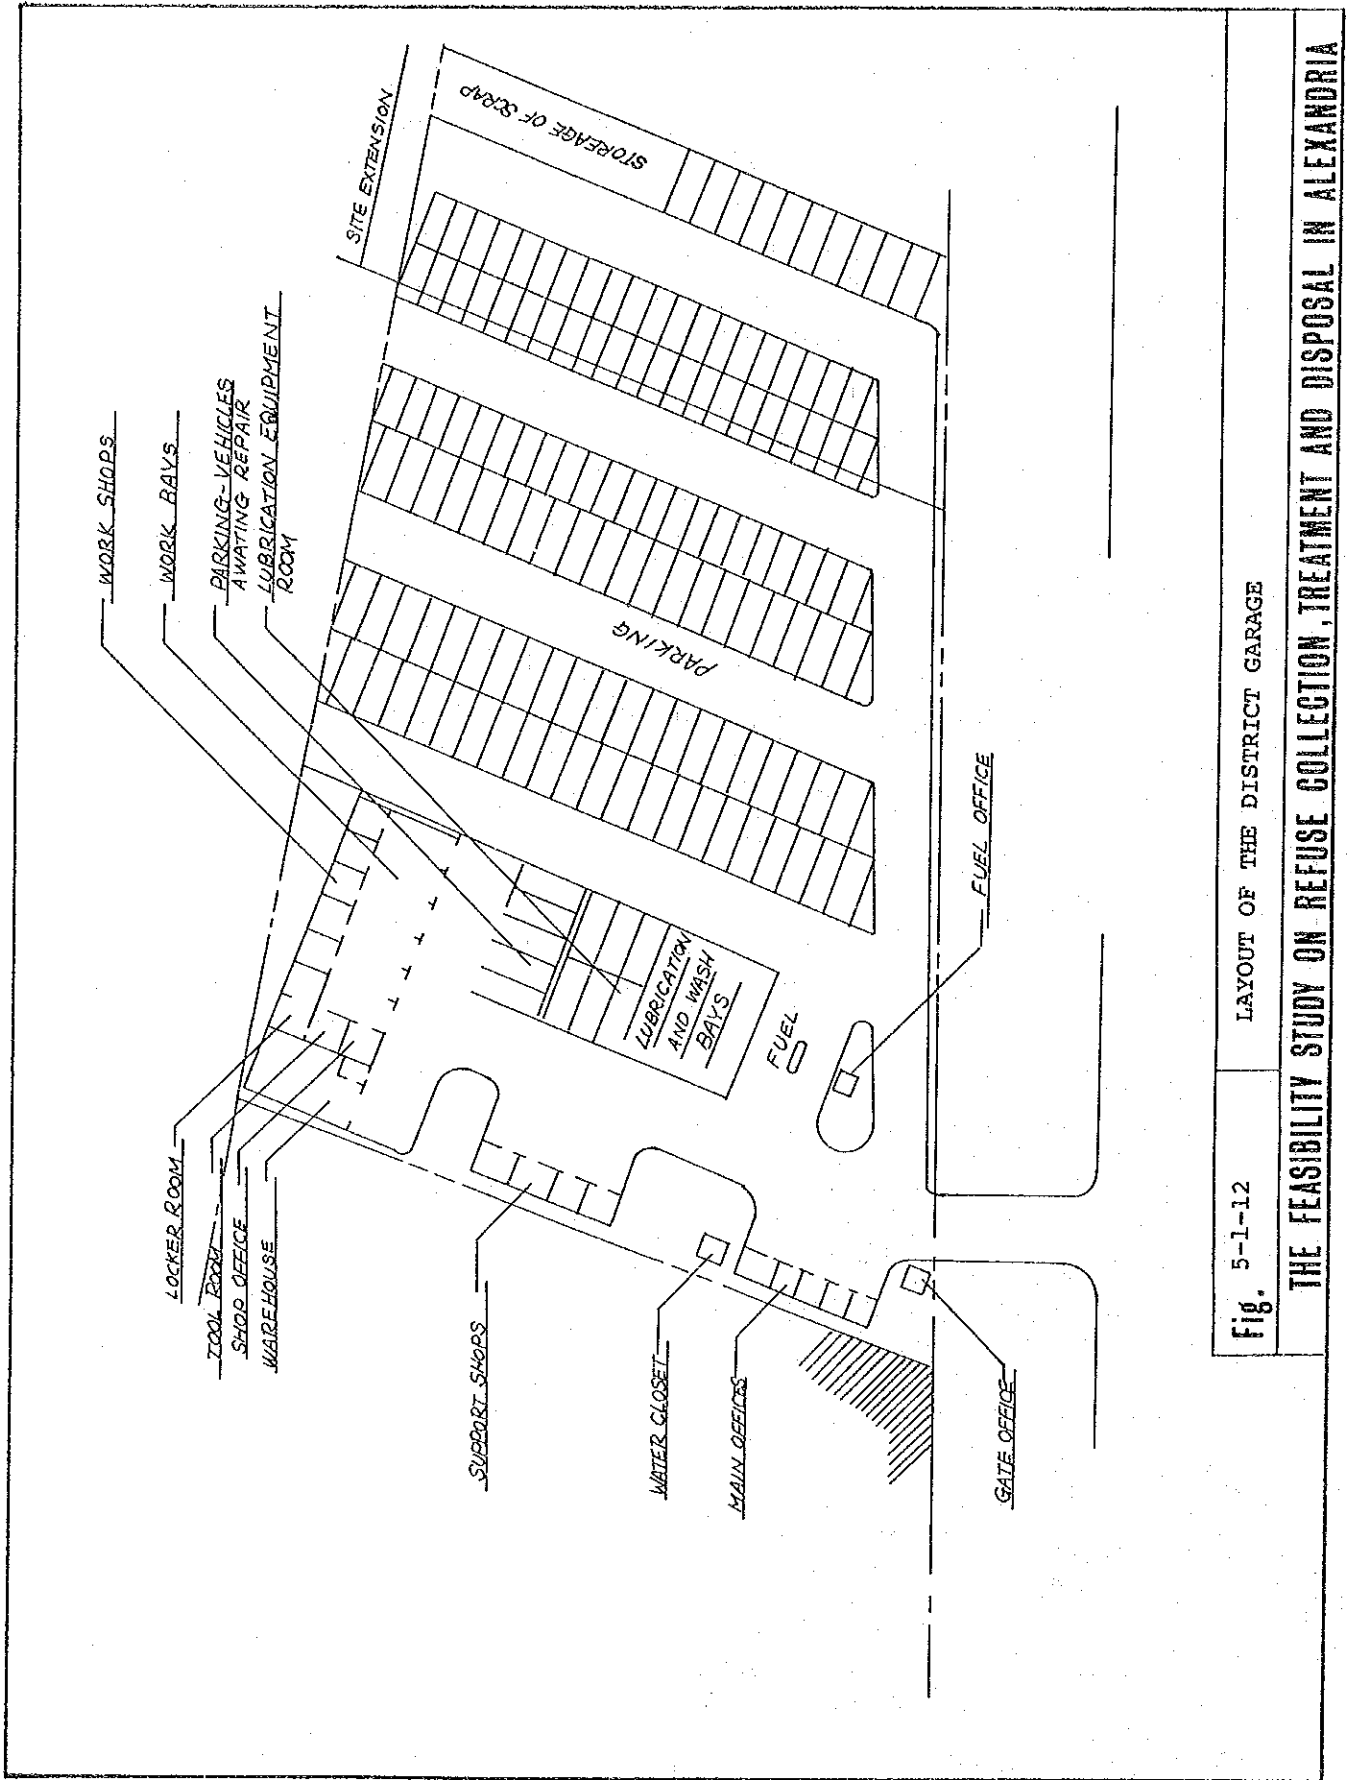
LAYOUT OF THE DISTRICT GARAGE
